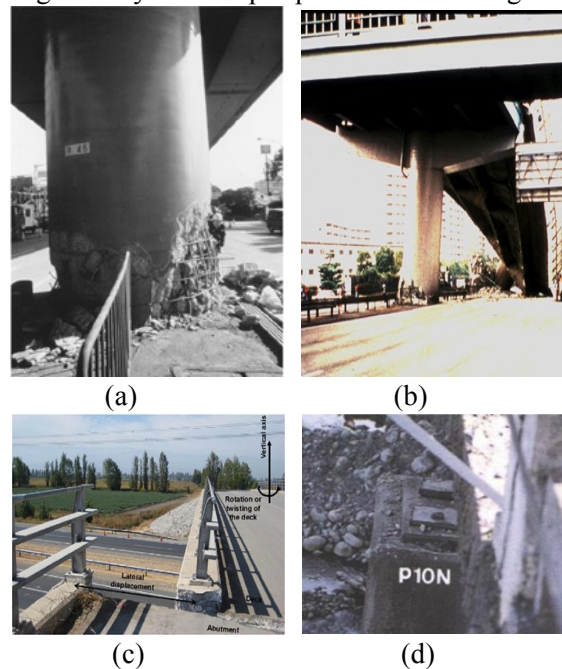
Bridge failures: (a and b) pier failure, and (c and d) dislocation failure
